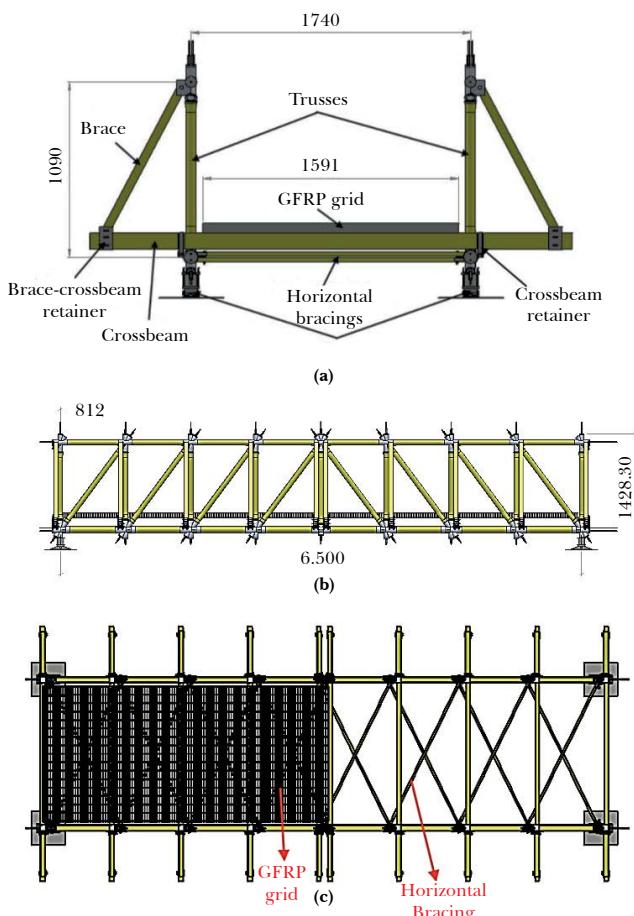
Dismountable bridge: (a) cross-section, (b) longitudinal elevation, and (c) top view (dimensions in mm). Source: Prepared by the authors.
